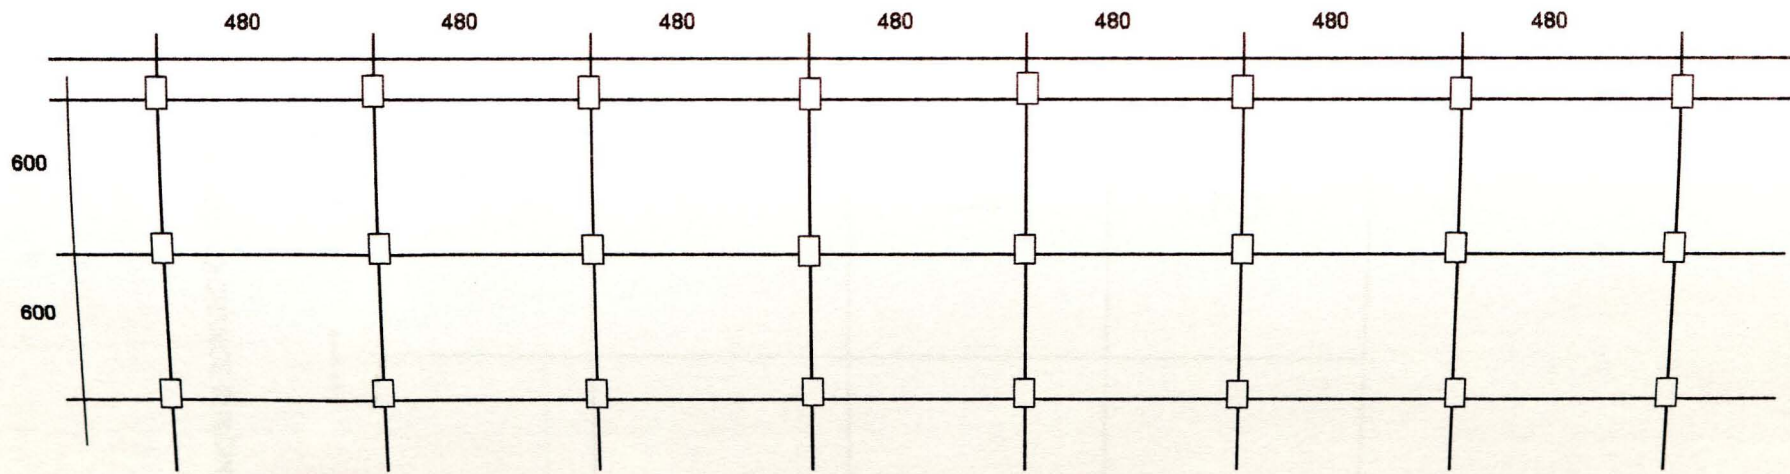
TELECOMMUNICATION EXCHANGE BUILDING FLOOR PLAN.
